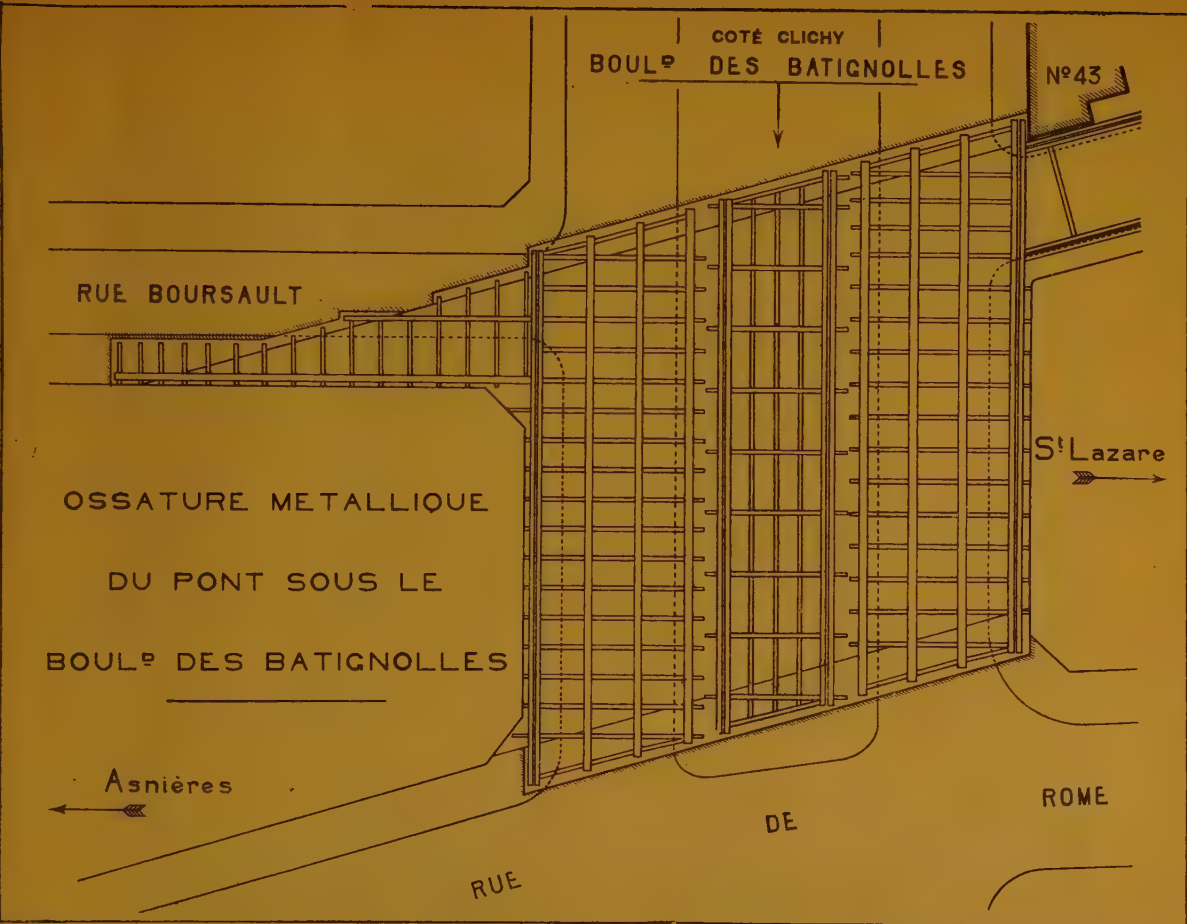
Boulevard des Batignolles bridge. — Plan view of framework.
